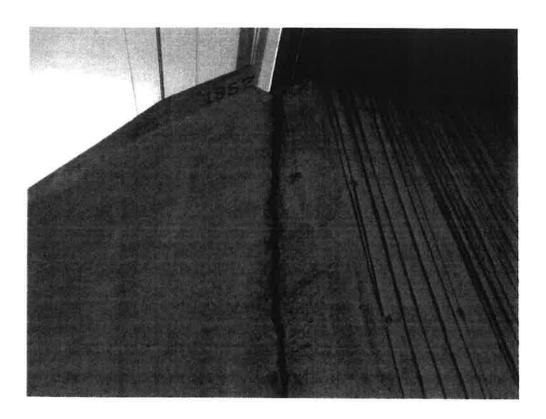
Northwest Corner, Large crack and demolished top of wall
